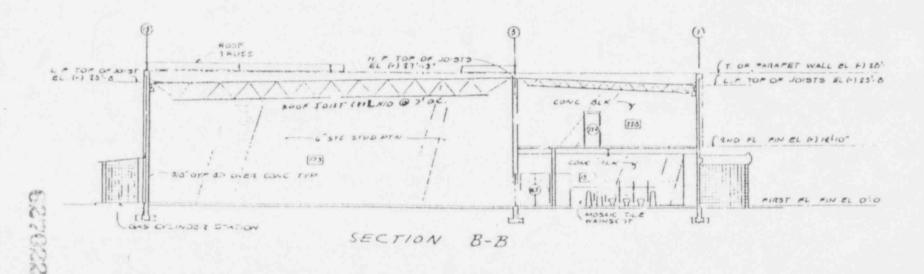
(b) BUILDING SECTION (NORTH-SOUTH)
